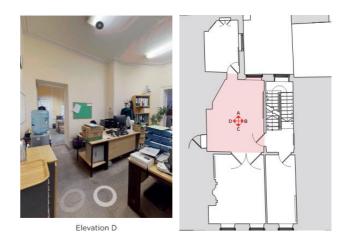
First floor rear room with modern plaster walls, small plaster cornice, door cojoining no.8 Great James Street and no fireplace.
